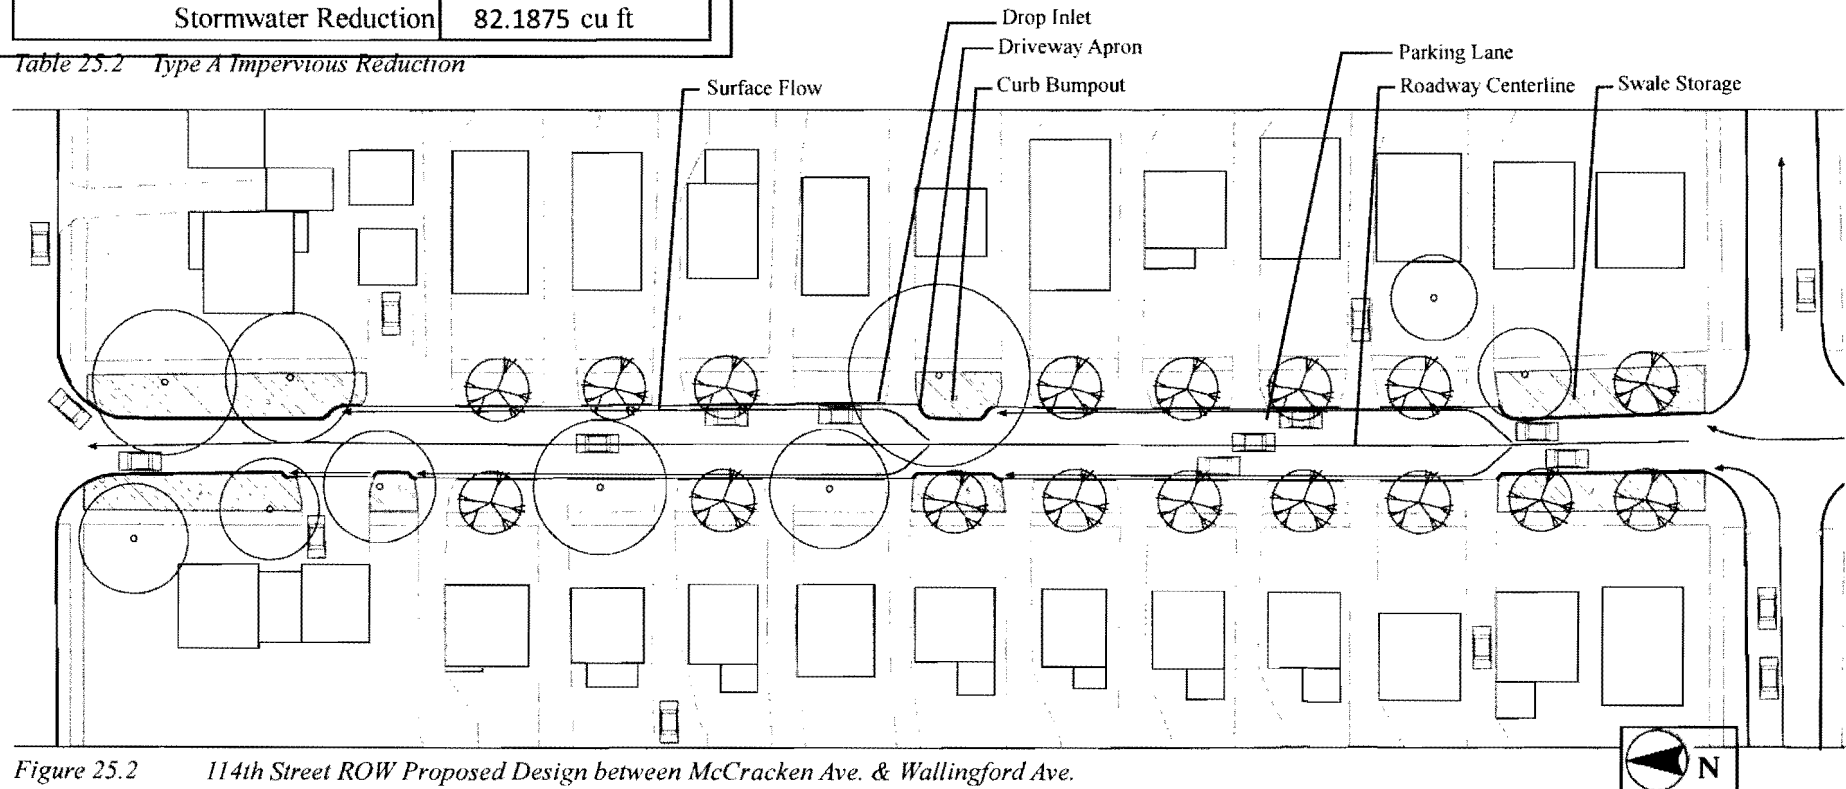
114th Street ROW Proposed Design between McCracken Ave. & Wallingford Ave.
